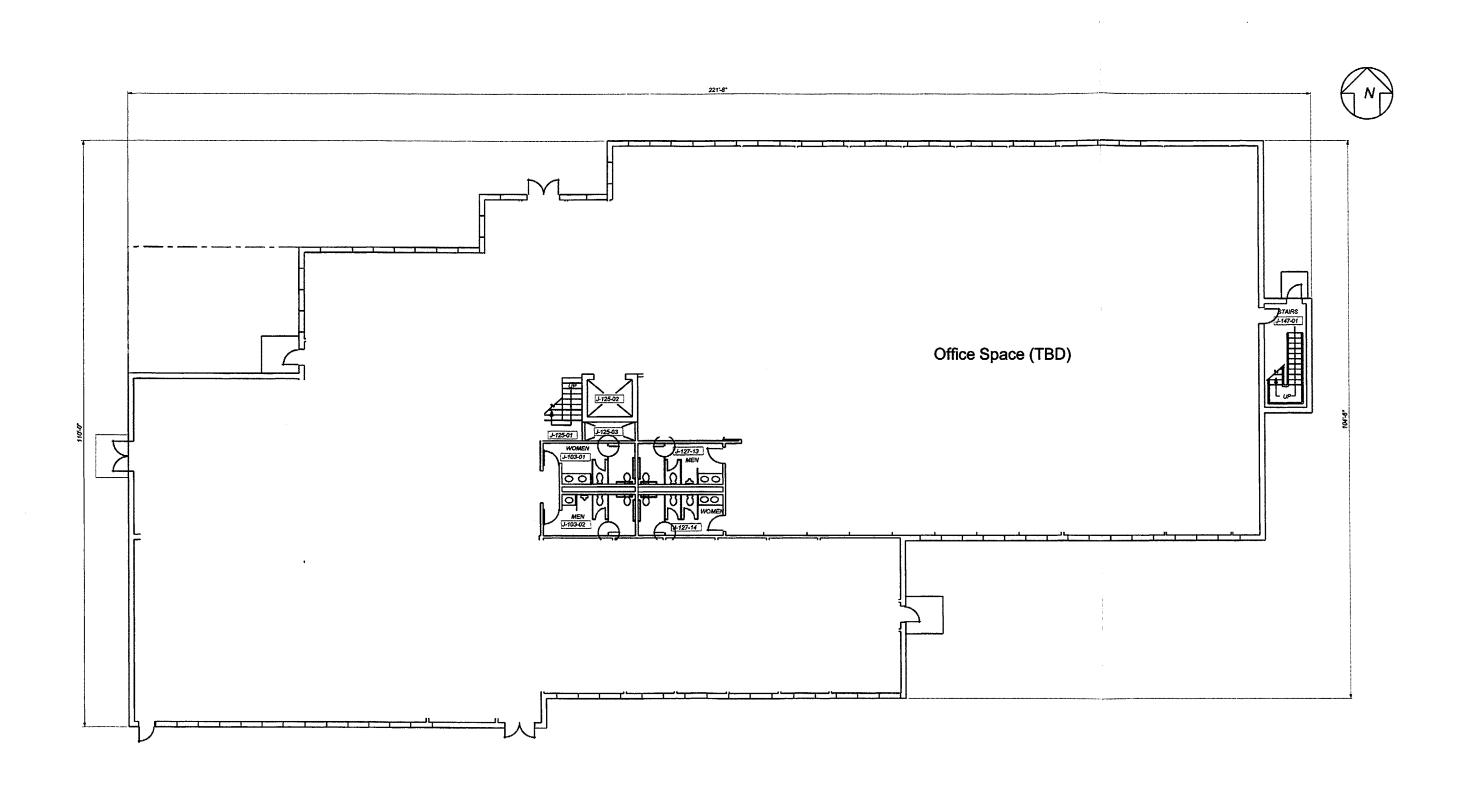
General Arrangement - Reagents Building (BRP) - Conceptual Layout
